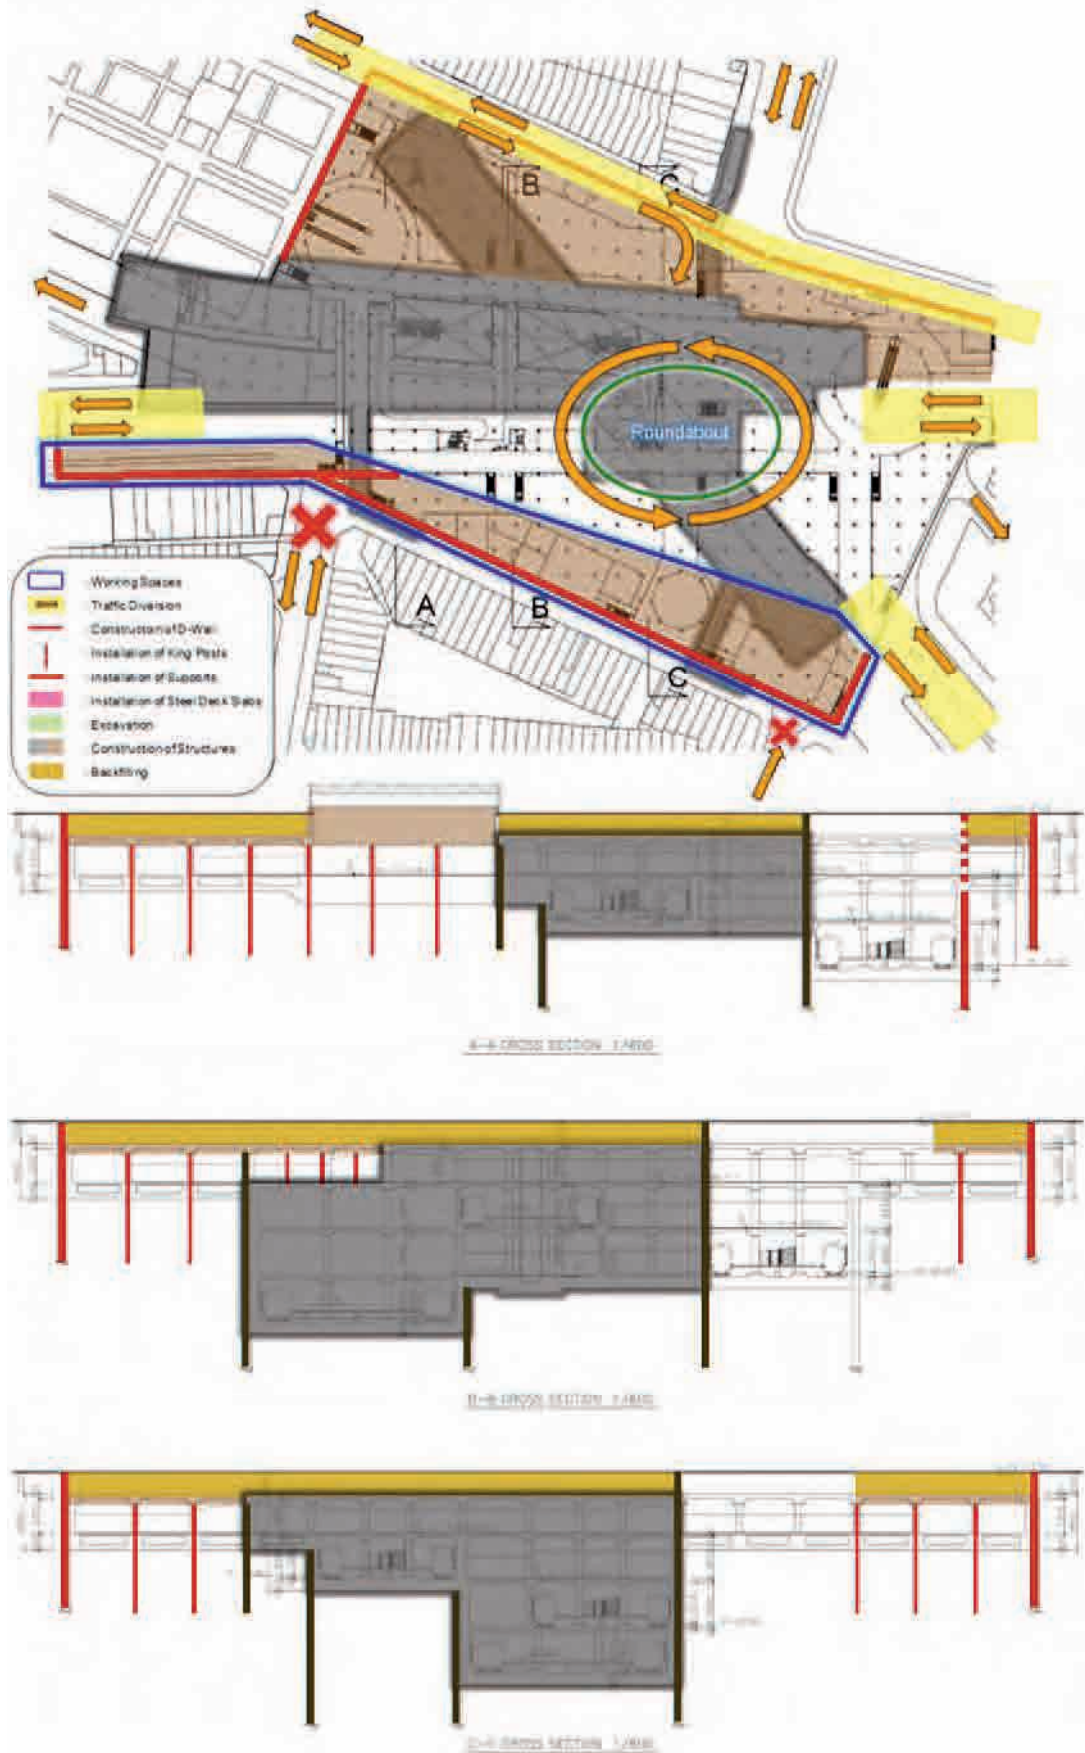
Construction Sequences of Ben Thanh Central Station (16/24)
